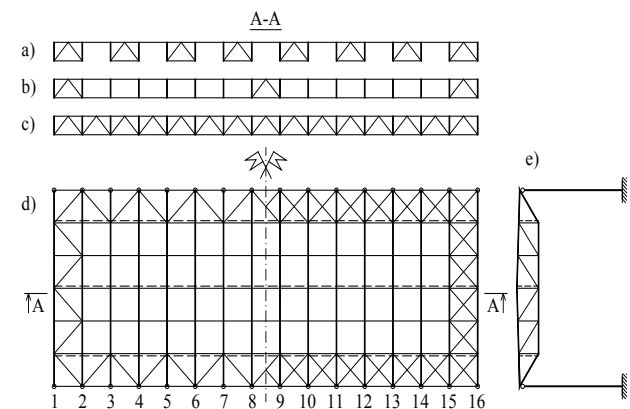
Truss bracings: a) discontinuous, in pairs, b) key lateral, c) continuous, coupling trusses, d) slope, e) spacing of bracings on the truss
